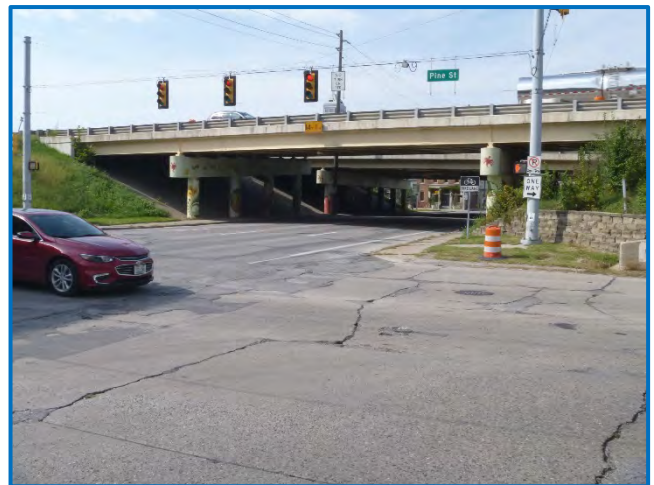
View of the I-65 bridges over Michigan Street facing west (10/5/2016).
